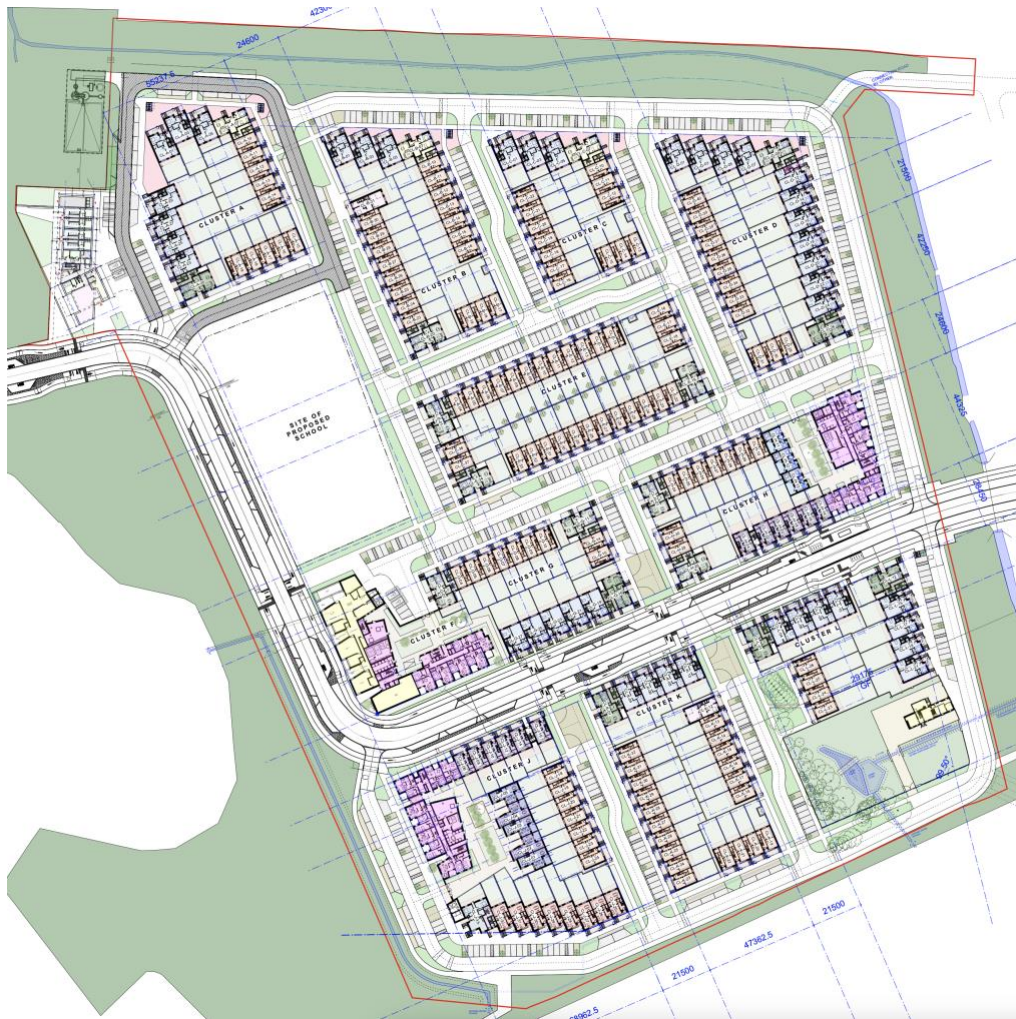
Proposed Site Layout Plan at Site 4, prepared by DTA Architects.
